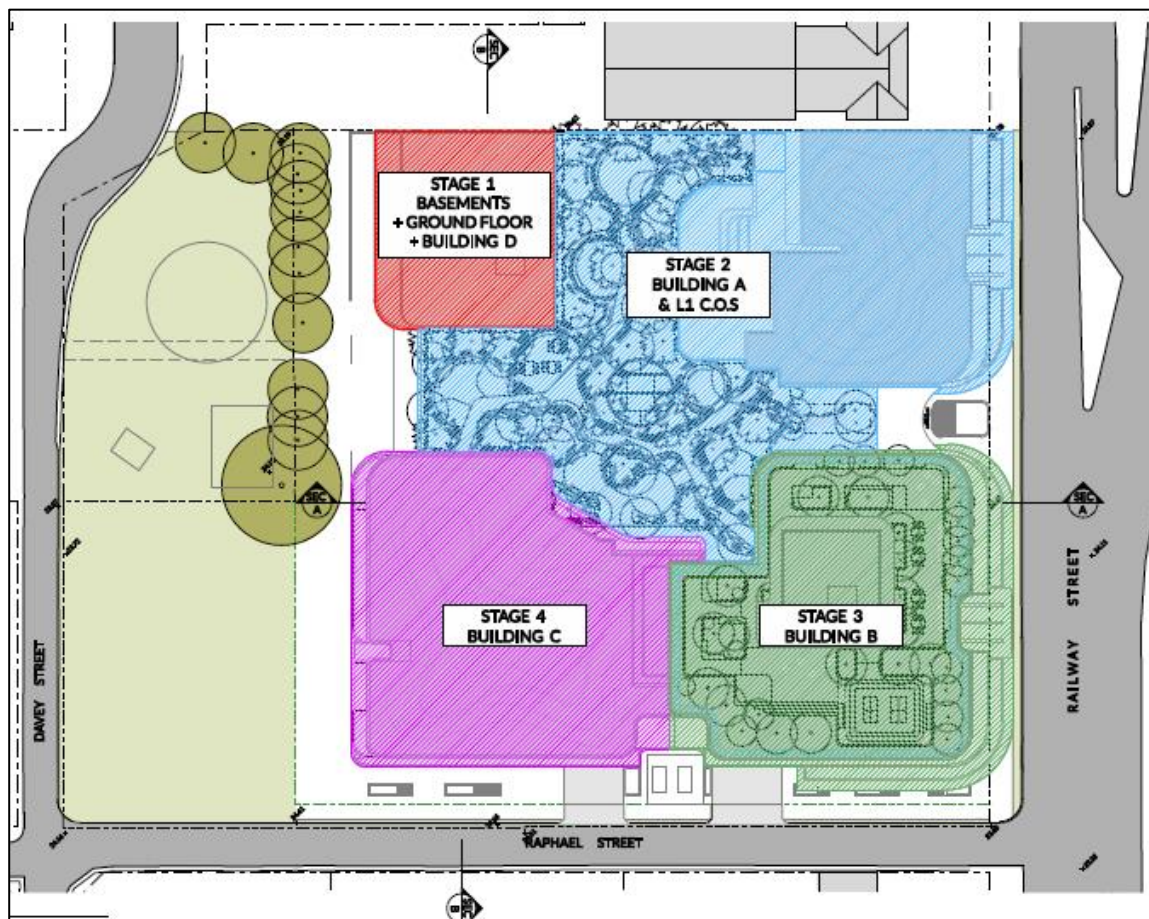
Extract of proposed Staging Plan (Source: Loucas Architects, 2021)
